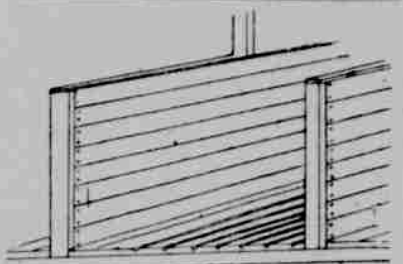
IMPROVED STABLE FLOOR. The plank used should not be over eight inches in width, and for a two-inch plank the groove should be cut seven-eighths of an inch wide and one inch deep. This can be done with a groove plane with a common plane a V-shaped
